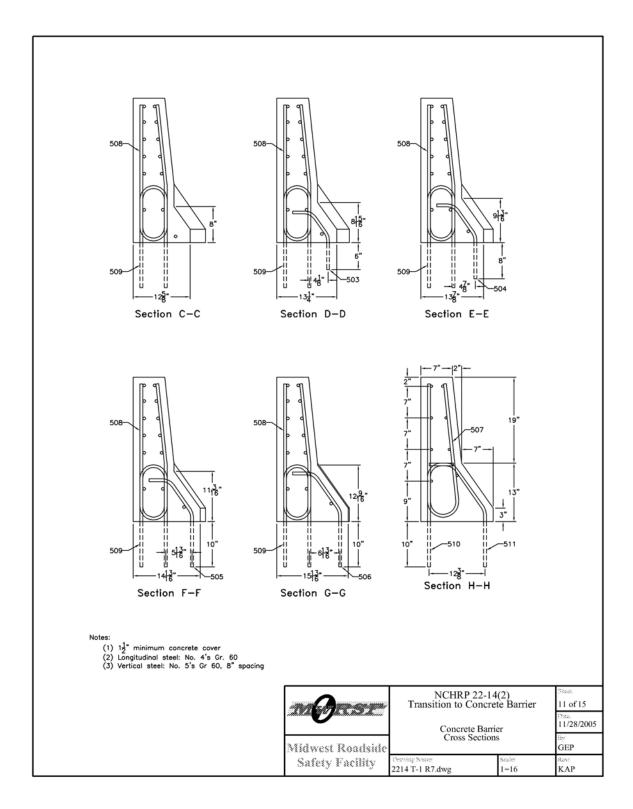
Approach Guardrail Transition to Concrete Barrier - Cross Section Details (English)
